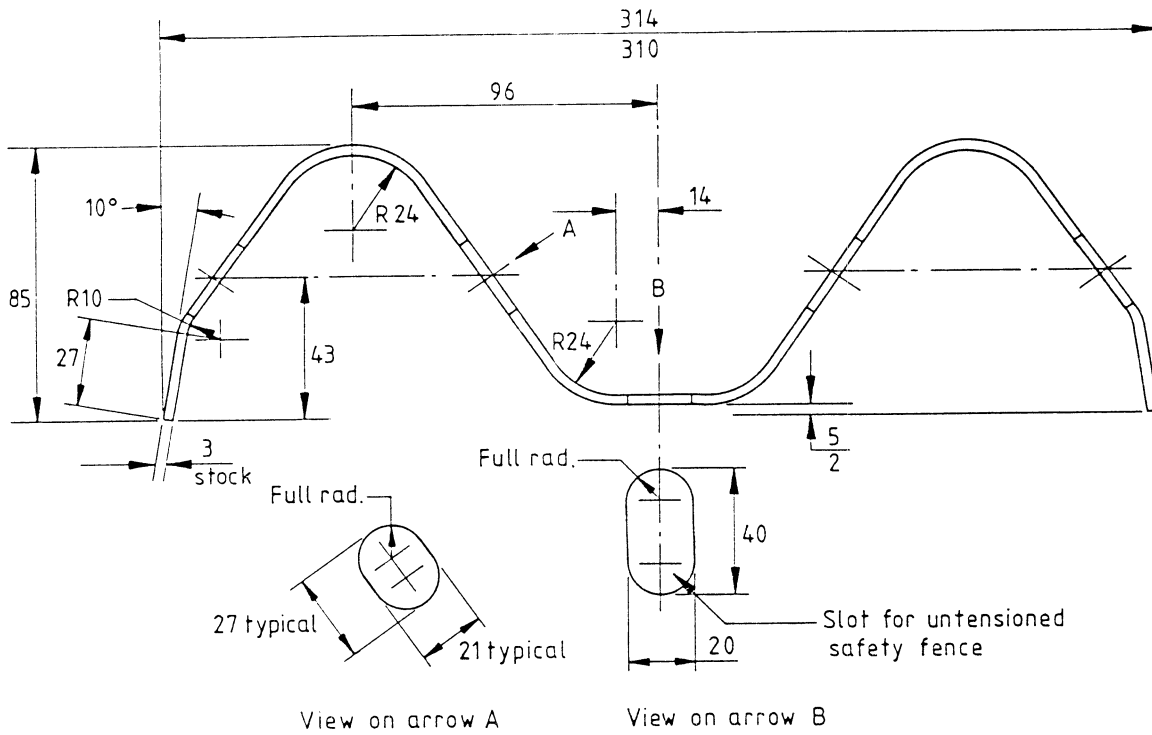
Details of beams for untensioned corrugated beam safety fence
